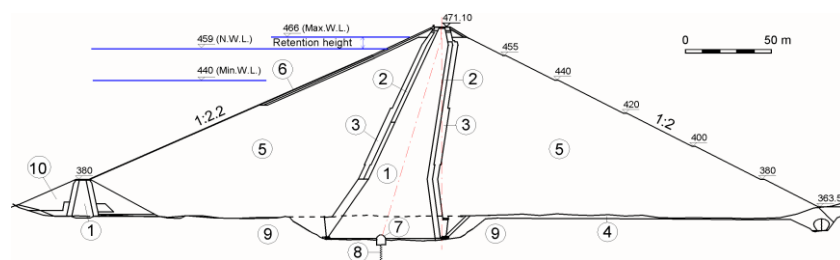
Main cross section of Kozyak Dam. (1) Clay core; (2) first transition zone; (3) second transition zone; (4) river deposit; (5) rockfill shells (limestone); (6) arranged slope protective stones; (7) grouting gallery; (8) grout curtain; (9) rock foundation (limestone); (10) gravel in the upstream cofferdam.
